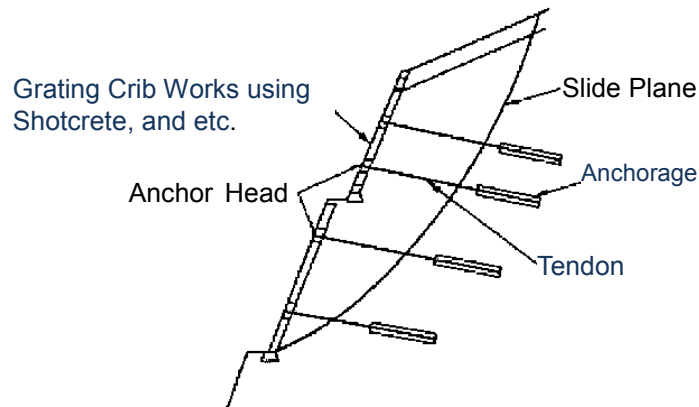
EXAMPLE OF GROUND ANCHOR
